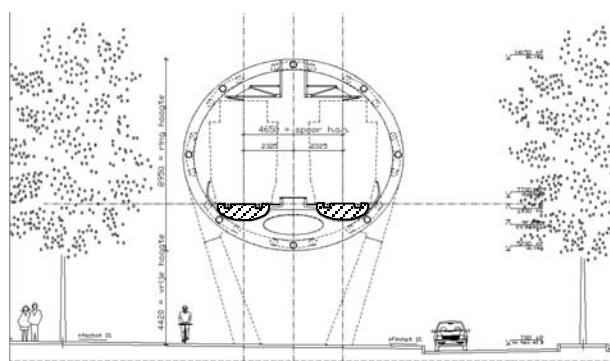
Final design with concrete beams (shaded) added to the steel fishnet stocking and both tracks joined in a single construction.
